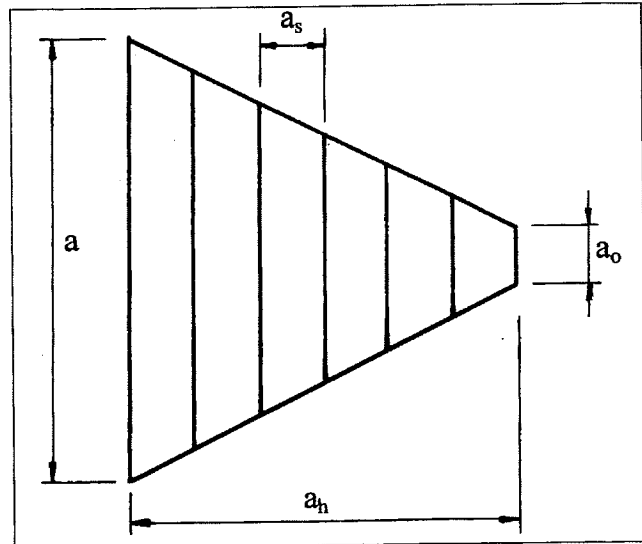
Equidistant arrangement of horizontal stiffeners of a hopper wall.
